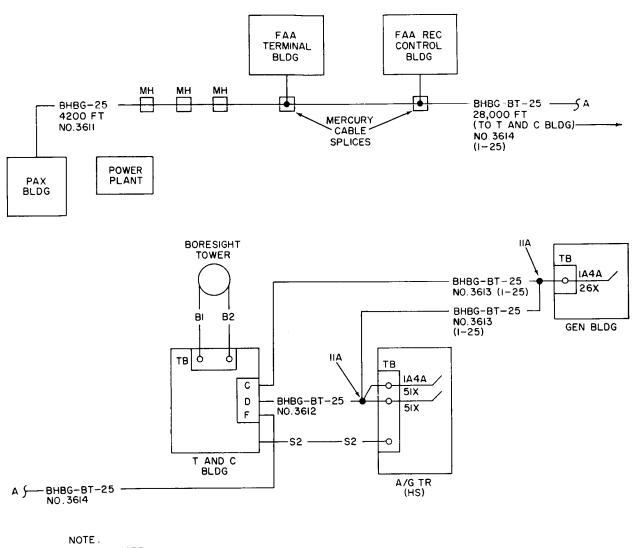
OUTSIDE PLANT CABLE SCHEMATIC, MUCHEA
